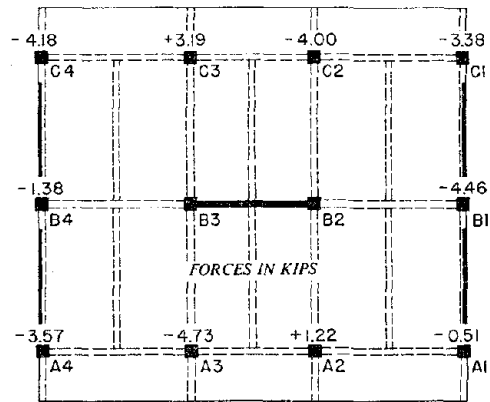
MEASURED COLUMN LOADS AFTER INSTALLATION OF ALL I.F.T.s.
